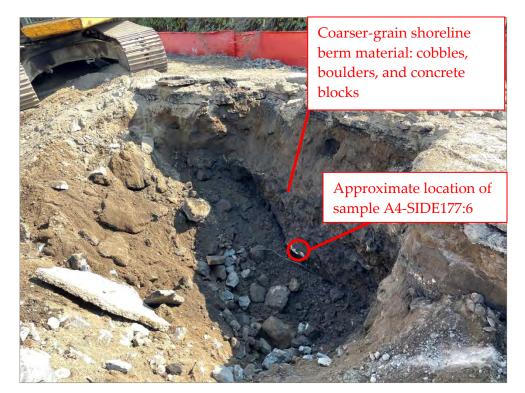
Excavation Activities at Area 4 Sample A4-SIDE177:6. Photo taken on August 31, 2022. View direction is south.
